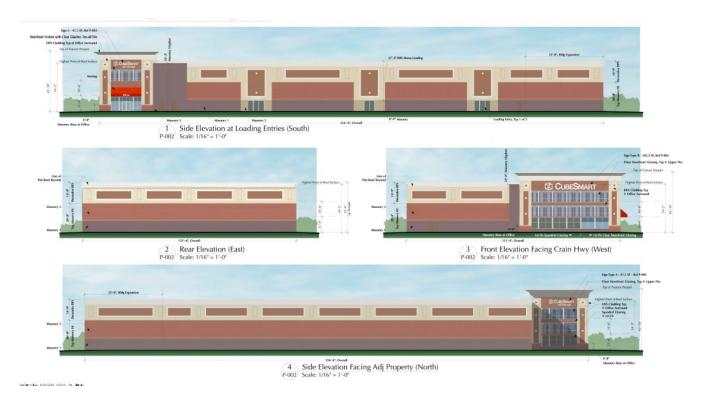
Proposed Elevations - Full Building (Phases One and Two)
